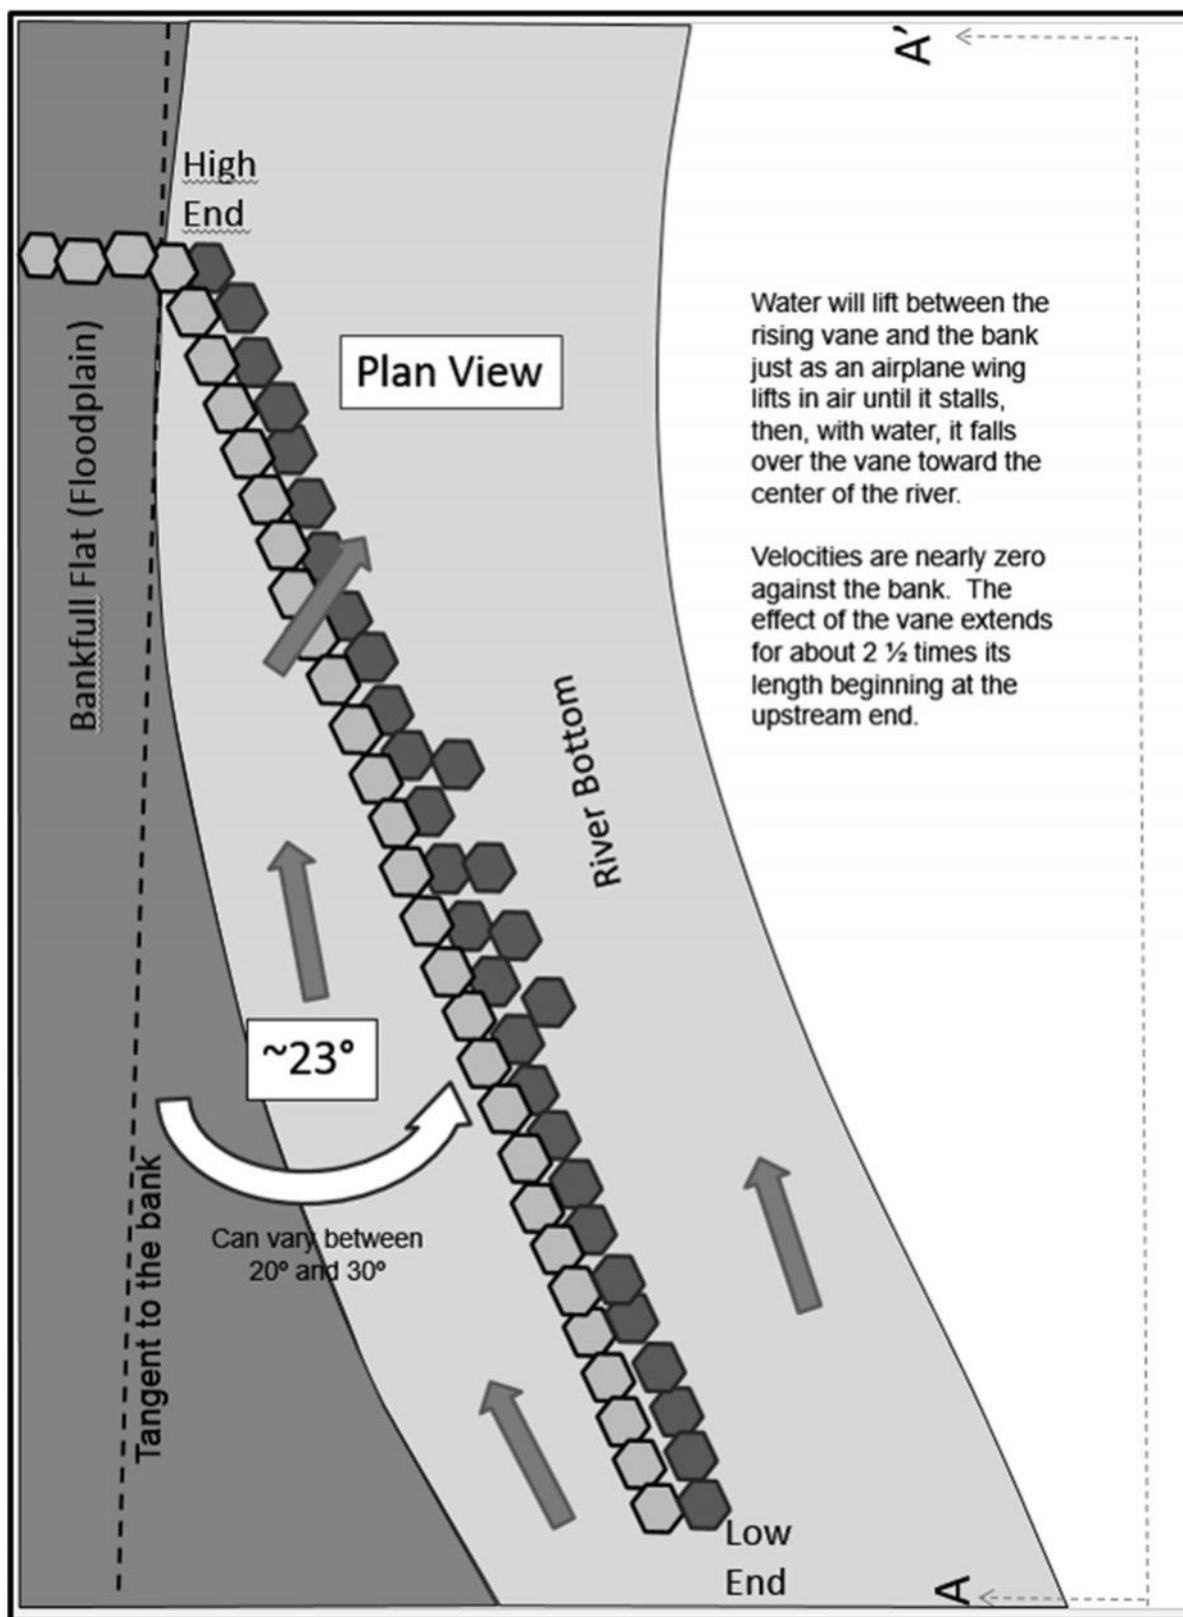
Plan view showing construction angle of all vanes on river left. See cross section A-A' in Figure 40.
